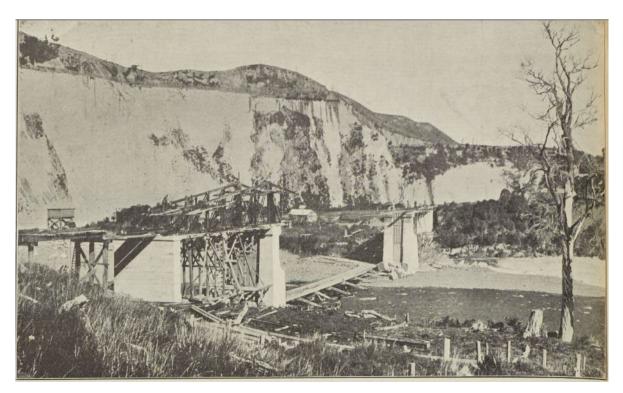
Low level bridge and the new cantilever bridge under construction, ca June 1904. *Auckland Weekly News*, Auckland Libraries Heritage Collection, AWNS-19040602-04-01
